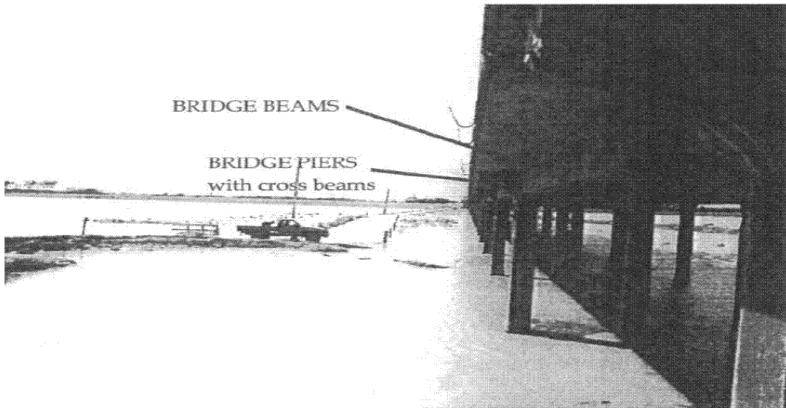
bridge substructure, downstream of bridge, looking north towards Foxtan.
